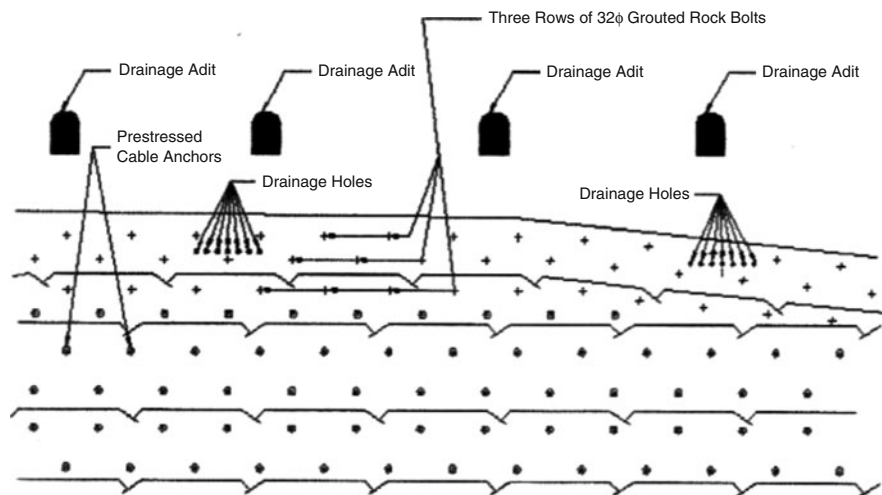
Section showing stabilization measures including installation of cable anchors on left bank.
